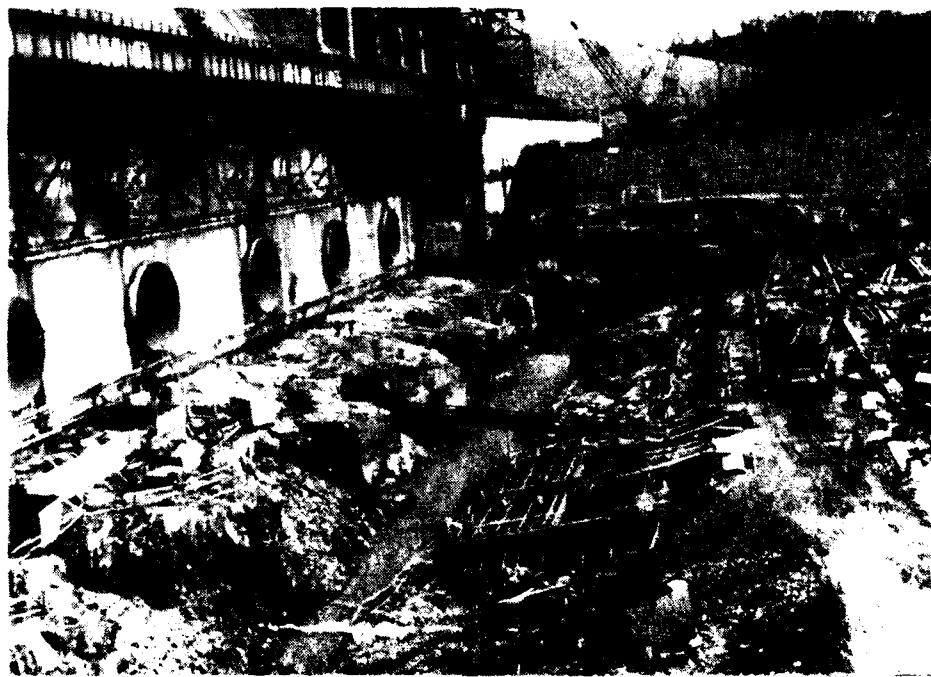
View of the destroyed or excavated area, showing the long structure in the background.
